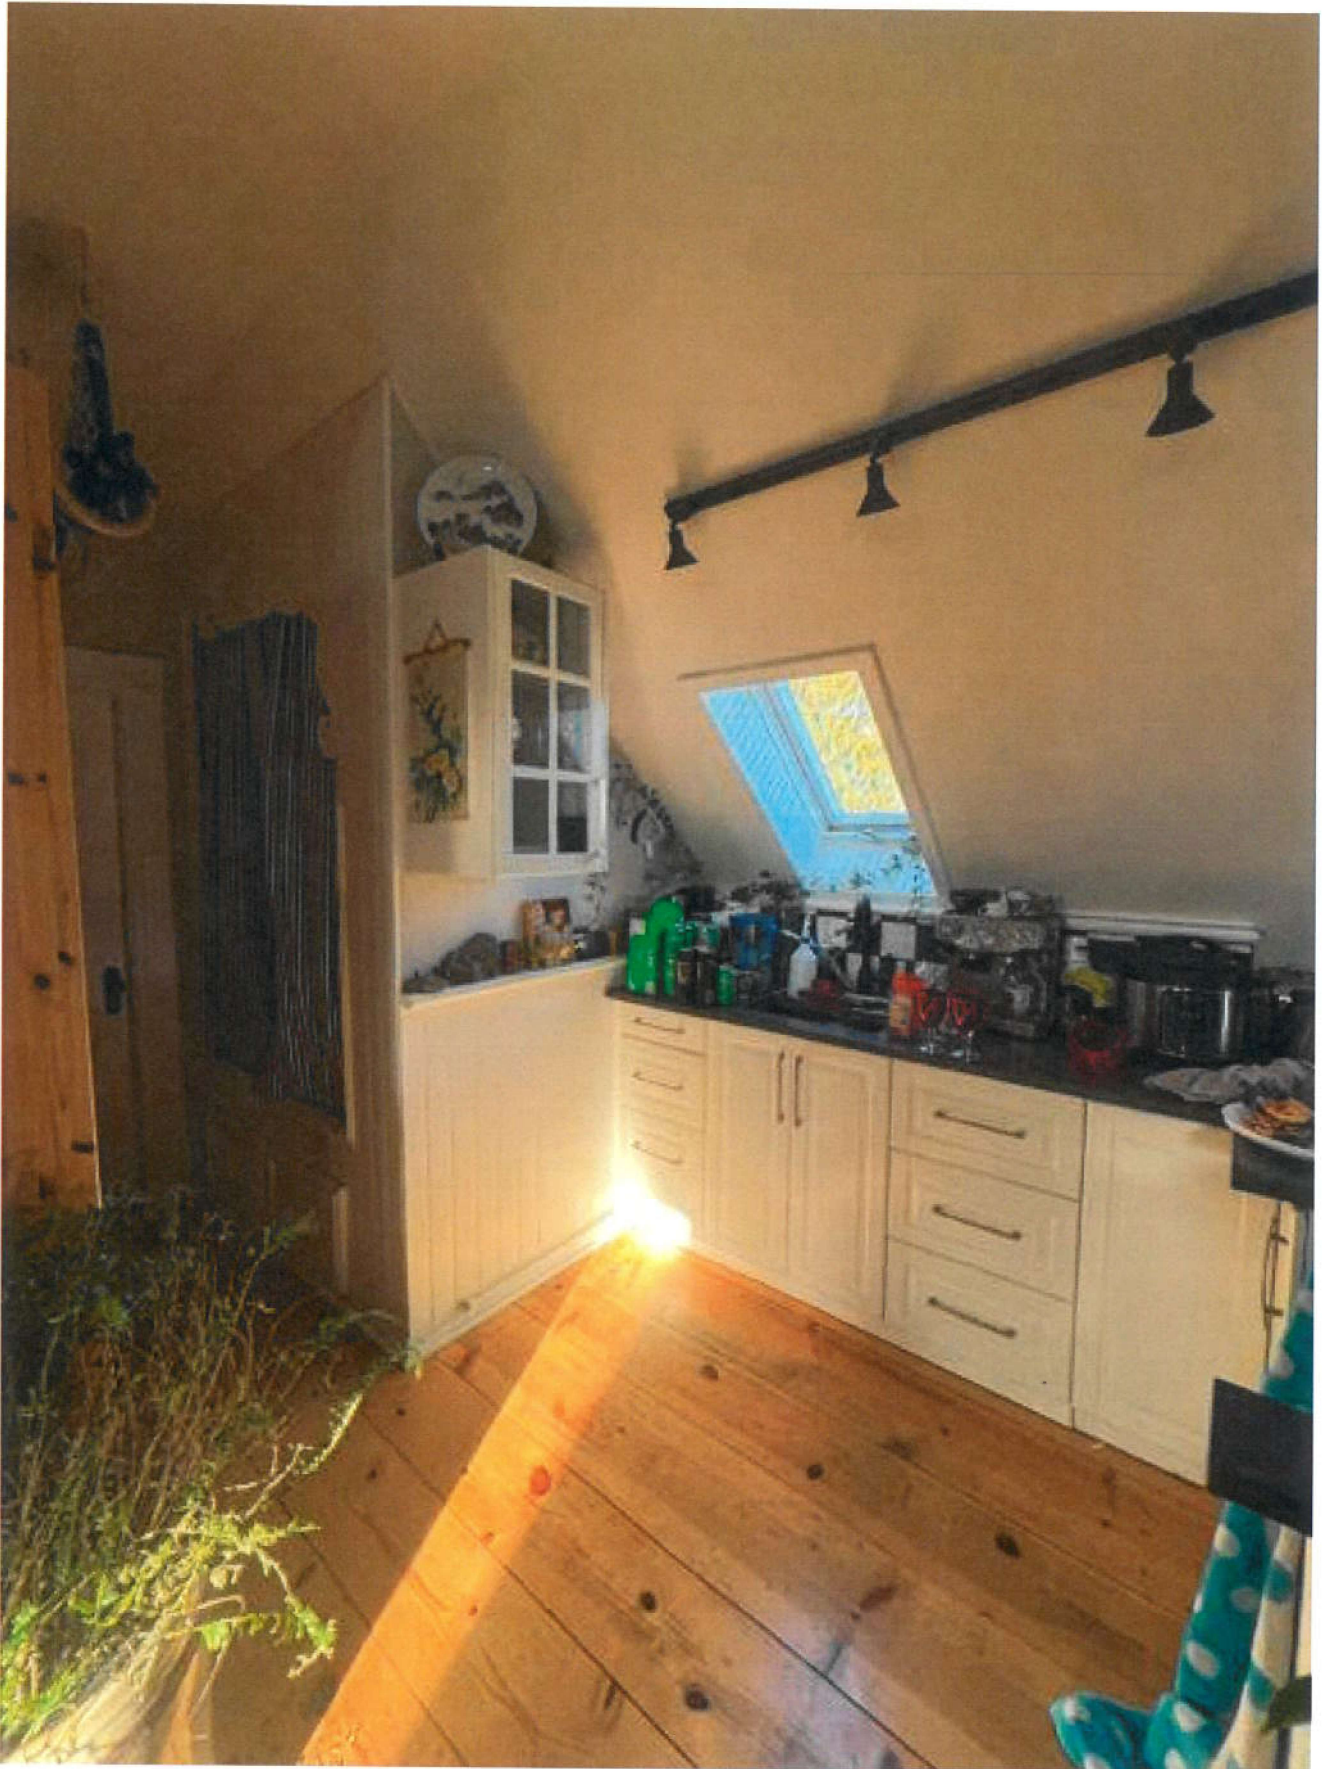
Unit # 5 / Attic ('E' on floor plan).
